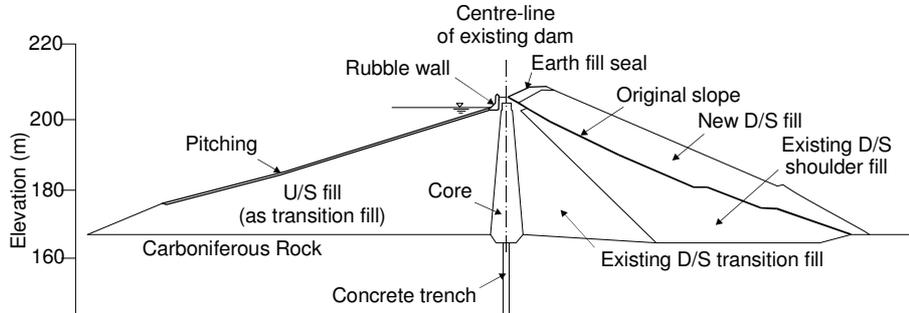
Typical cross-section of old and reconstructed Ladybower Dam.
